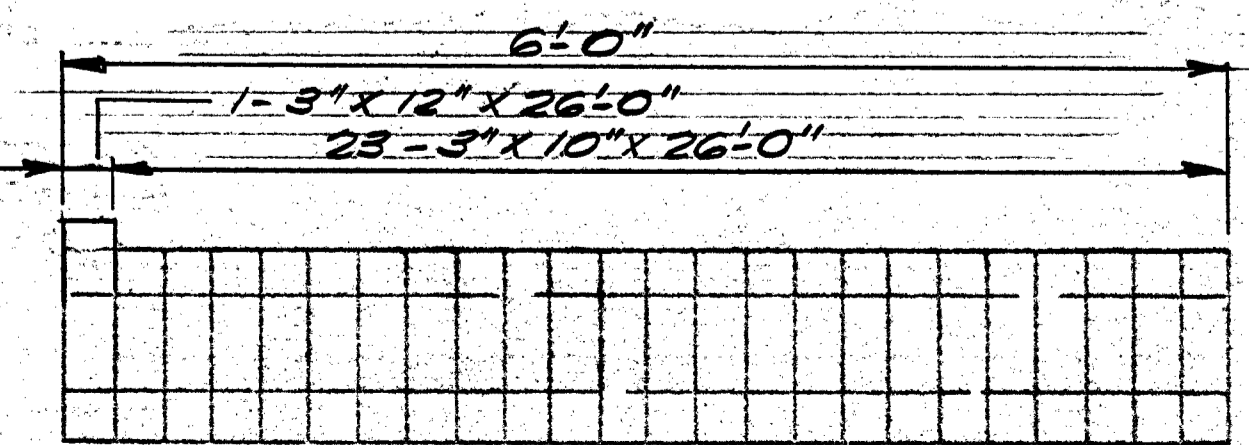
" x 10" & 3" x 12" PLANK BORING
